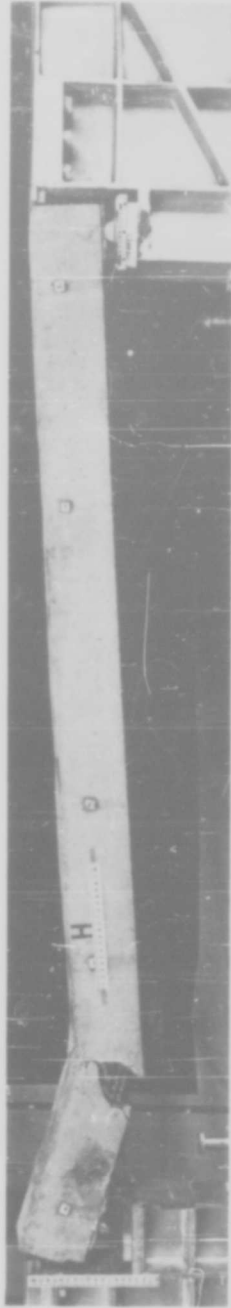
Beam H after a static load of 260 lb/linear inch.
